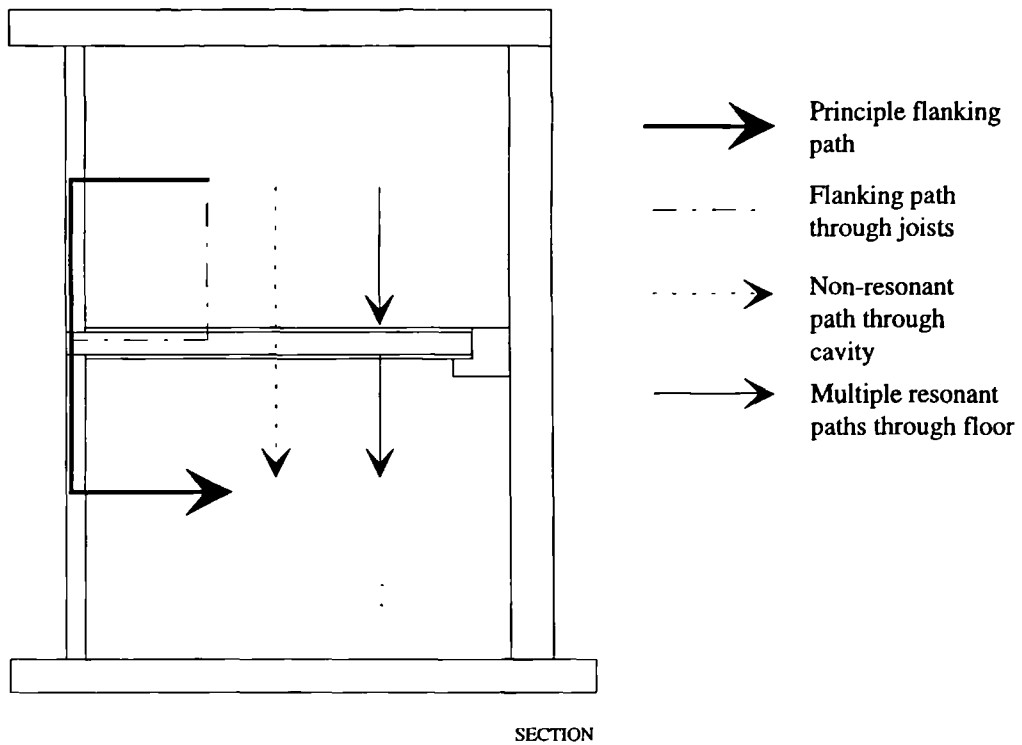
Section through built-in timber floor showing SEA transmission paths and principle flanking path through connecting wall.
